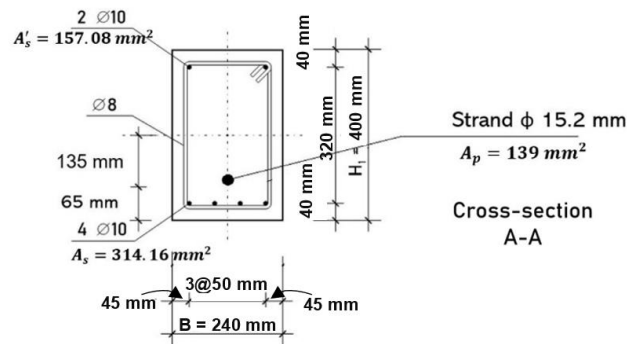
The cross-section dimensions of the prestressed concrete beam at section A-A
